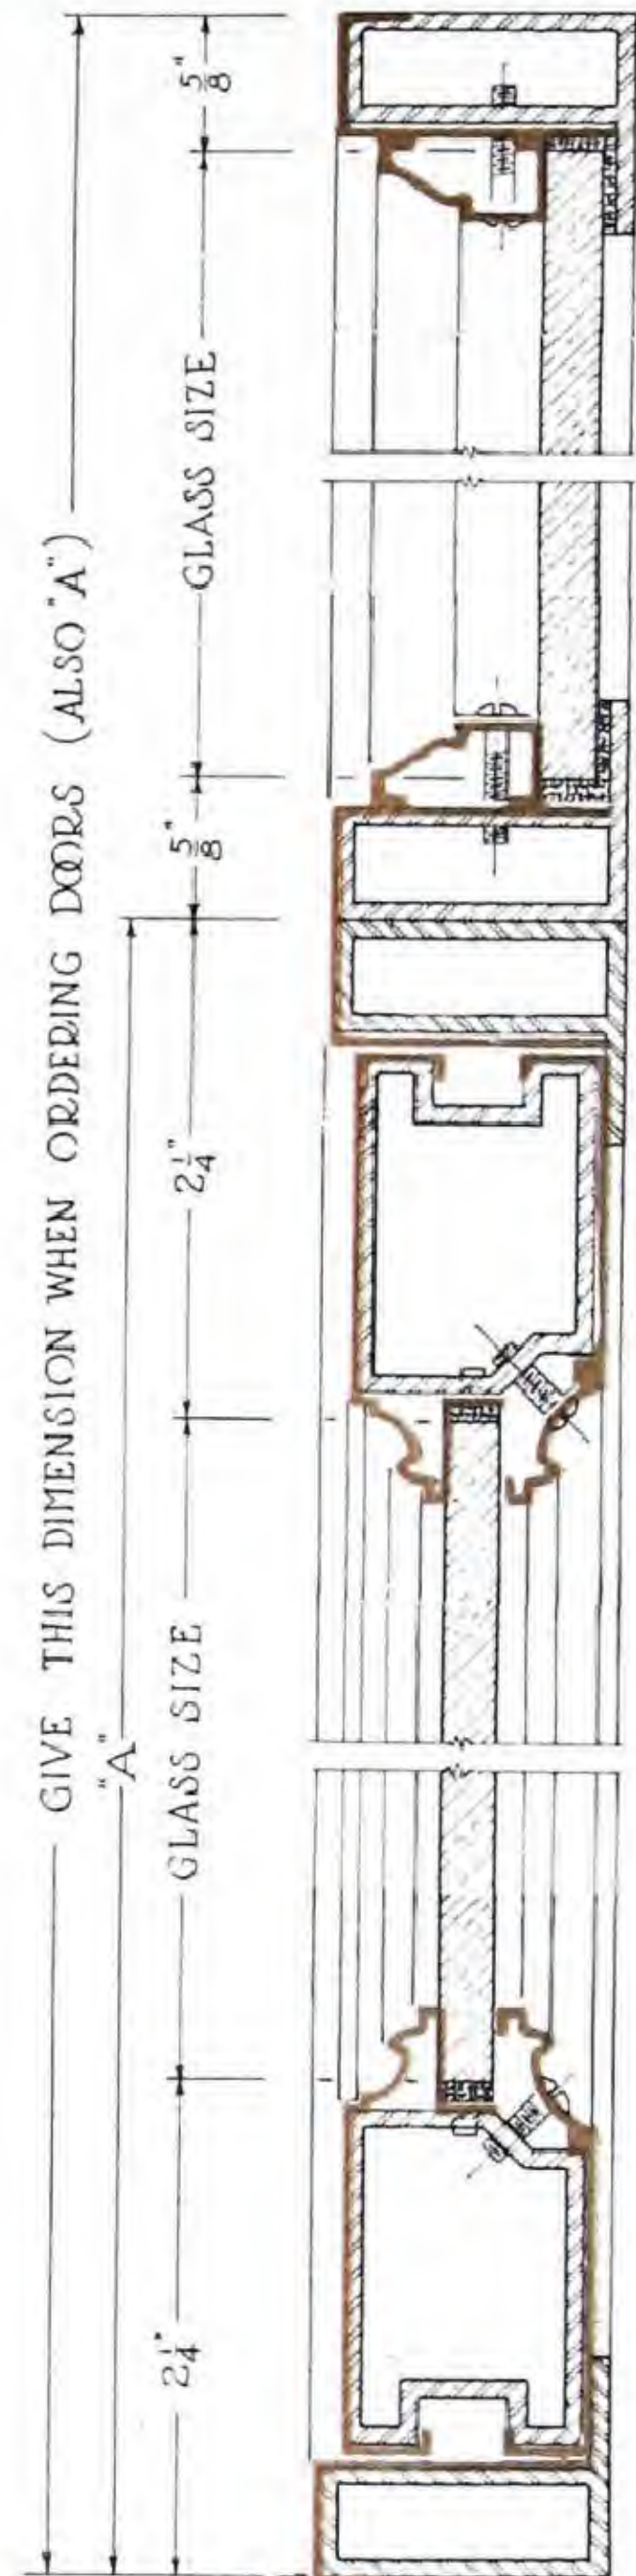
C SHOW CASE DOOR FEATURING N° 1442 STIFFENER.
